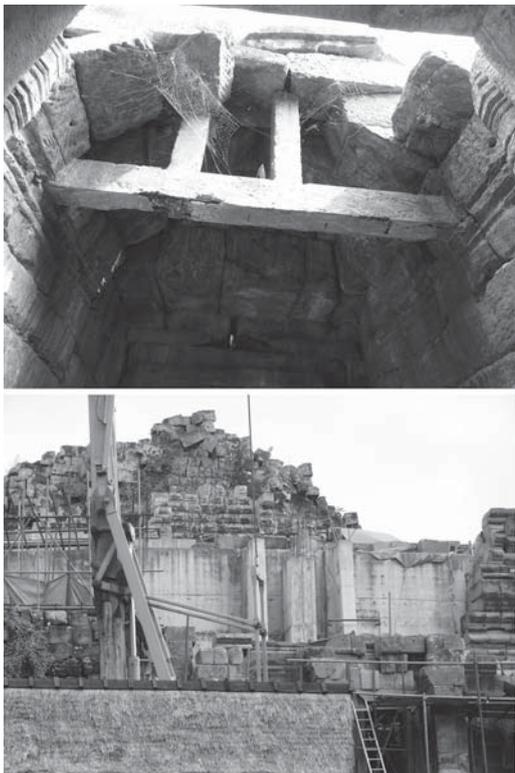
Reconstruction interventions with application of concrete – support of the damaged gallery vault of Preah Khan temple; replacement of laterite wall for reinforced concrete one of Baphuon temple (Source: author)
